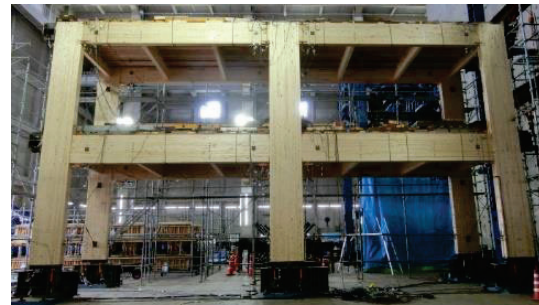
Tested full-sized 2-story glulam frame jointed by the drift pins with inserted steel plate.
